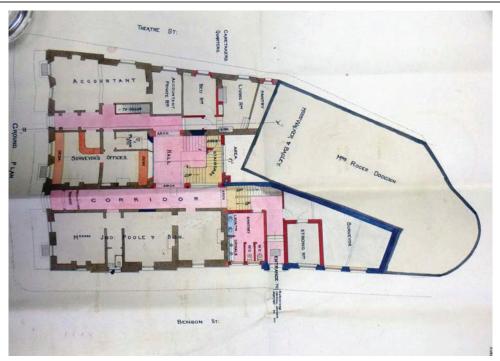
(left): Ground floor plan, dated 1901 (CAC(B) Z/1028/2 1901-1904)
